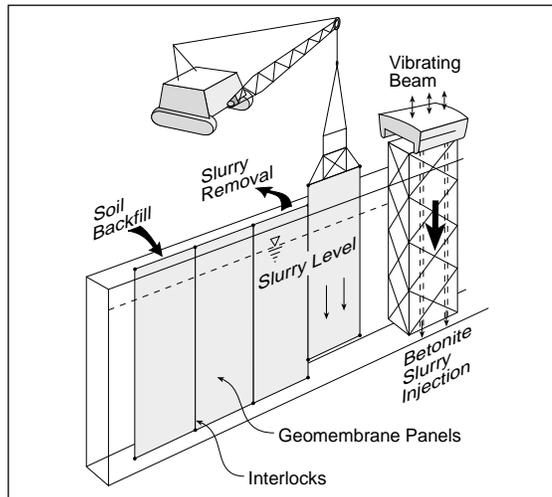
Vibrating beam/slurry trench support method with geomembrane panels as secondary operation
